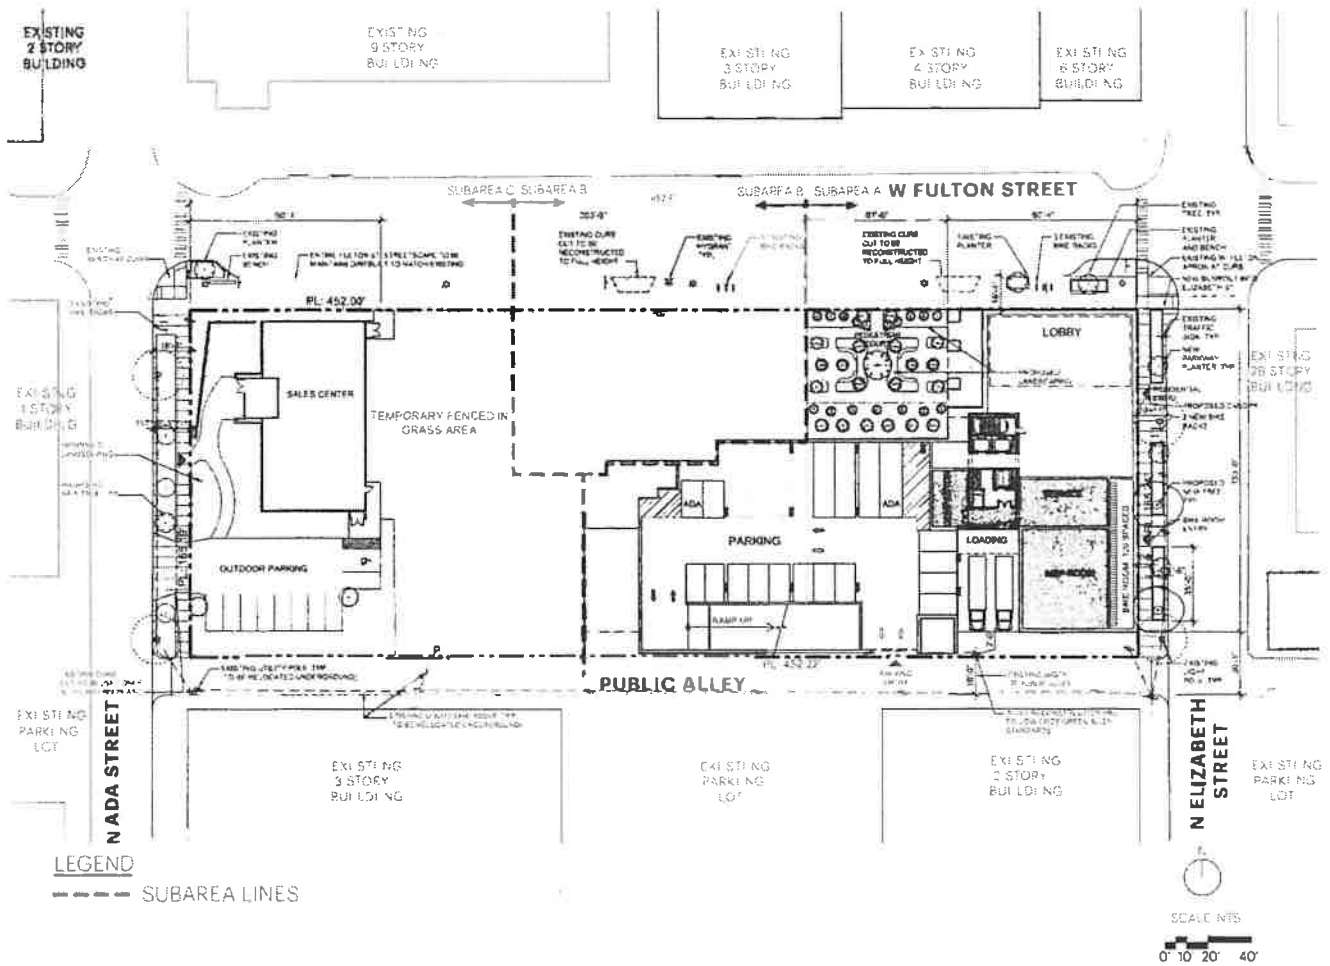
A: SITE PLAN (PHASE I INTERIM CONDITION)
